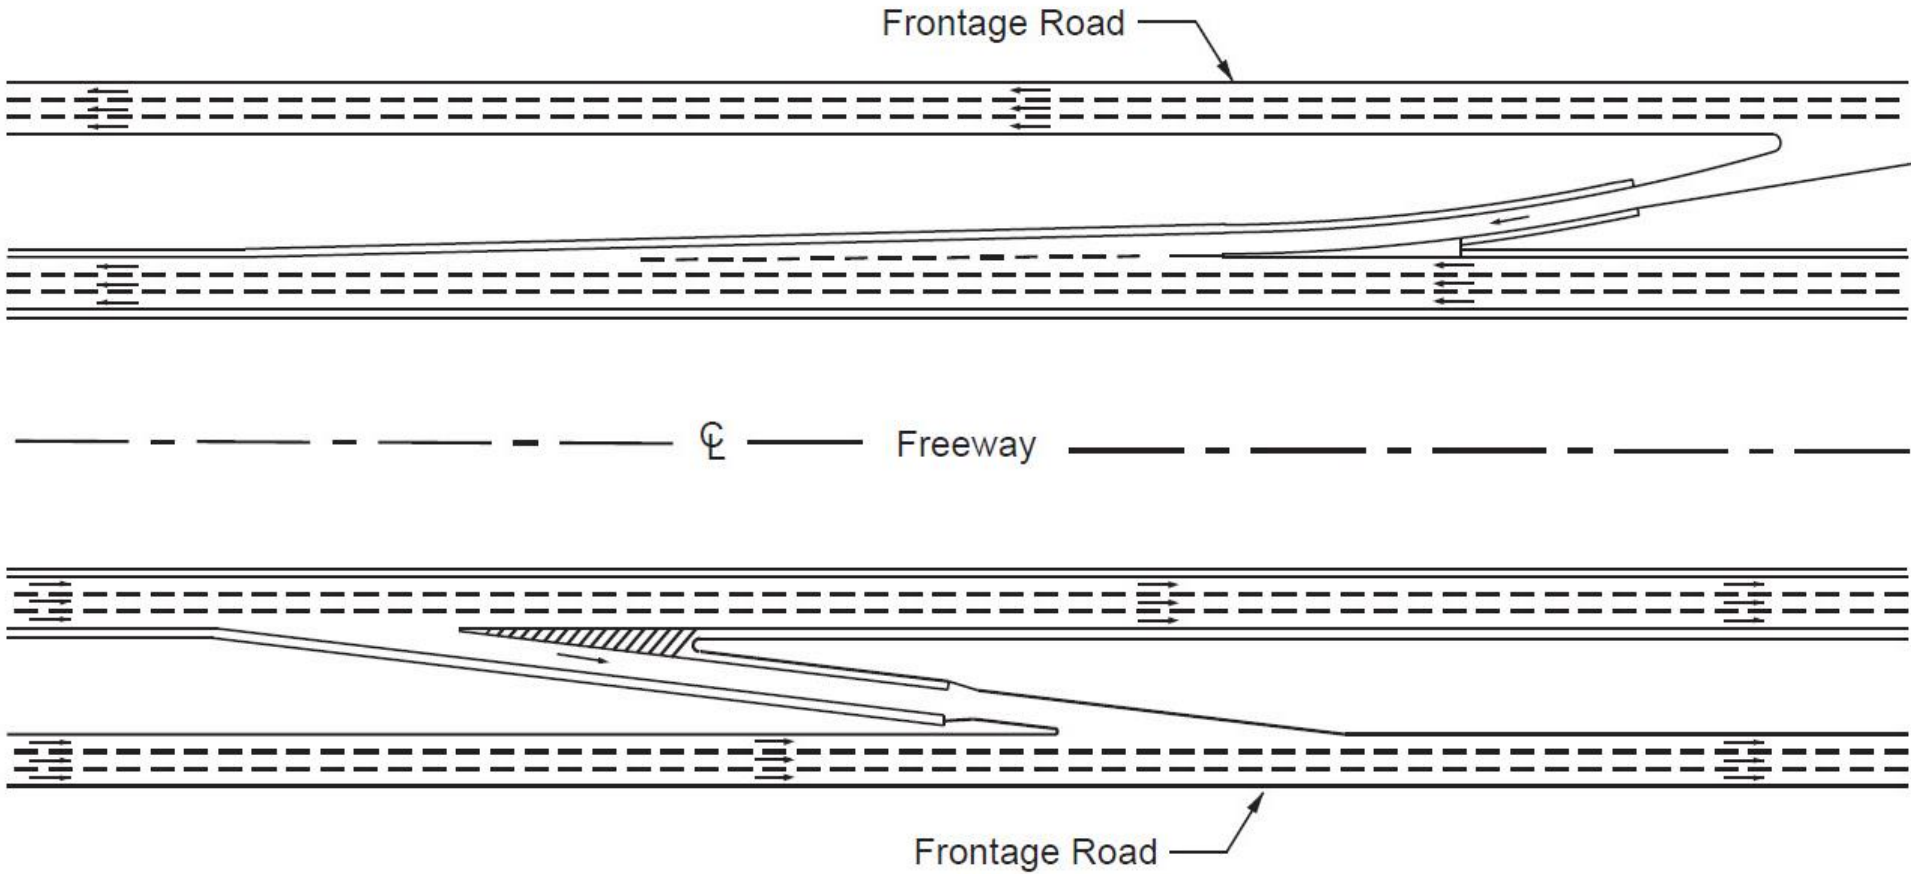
One-Way Frontage Roads, Entrance and Exit Ramps
